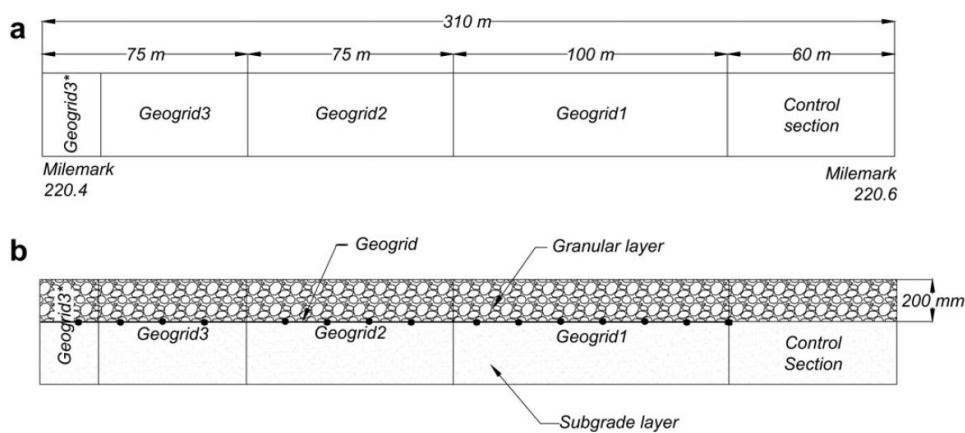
Schematic diagram of the test section, (a) plan view, (b) cross section. (Mekkawy et al., 2011)
